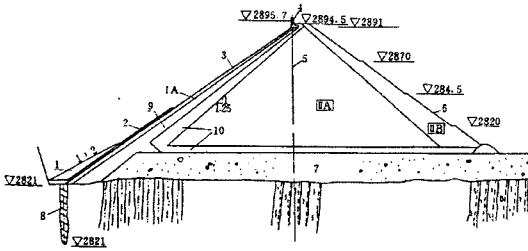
Zoning of Heiquan CFRD (1. random fill, 2. clay blanket, 3. concrete face, 4. parapet wall, 5. dam axis, 6. slope protection, 7. alluvium, 8. curtain grouting, 9. transition zone, 10. drainage zone, I A. bedding zone, II A. sand-gravel zone, II B. downstream rockfill zone, after Pan and He, 2000)
